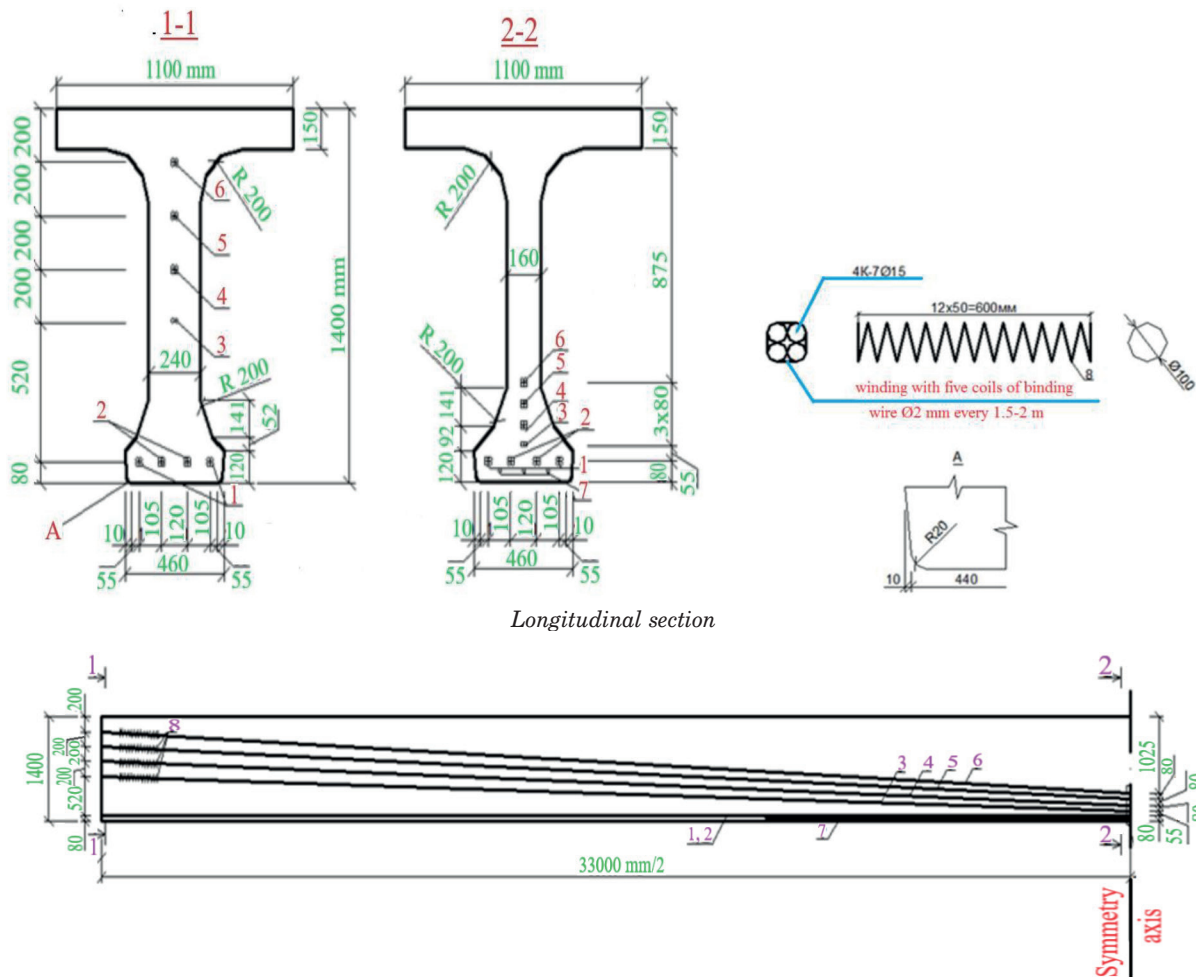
Longitudinal section and cross sections of the VTK-33u beam
